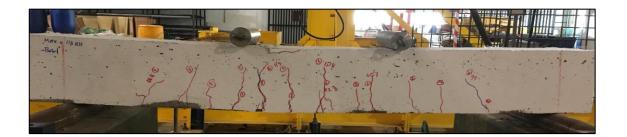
Cracking Pattern of RCA-SF1% beam
